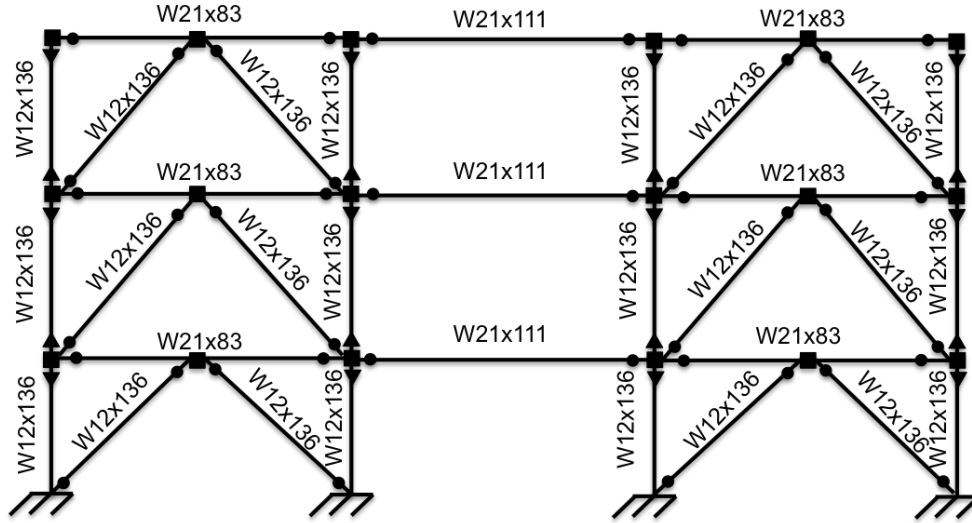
Two Bay Three Story Chevron Brace Frame - Sections
